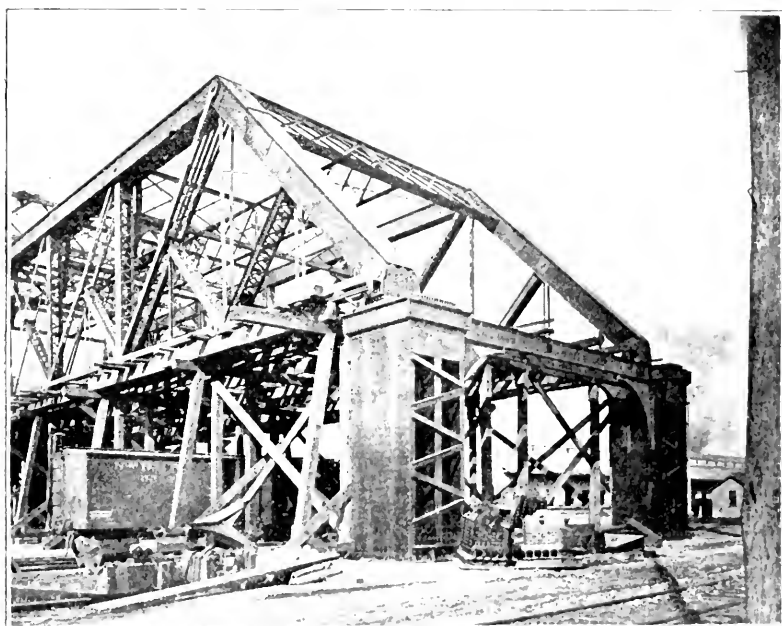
TYPICAL TRUSS AND COLUMNS.
